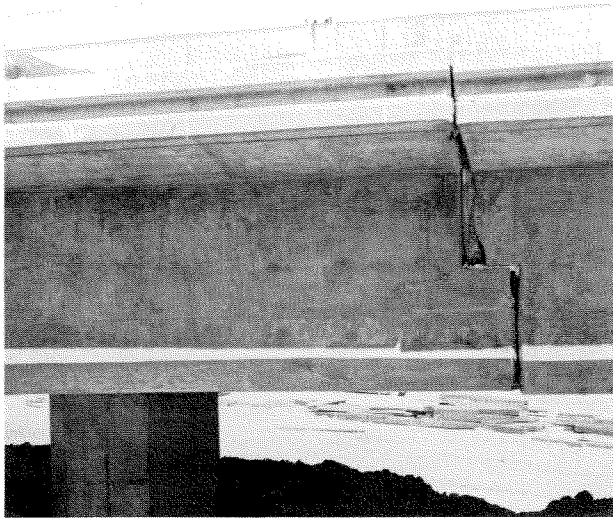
Damaged joint on the remaining western section of the collapsed overcrossing, Golden State-Antelope Valley freeway interchange.
